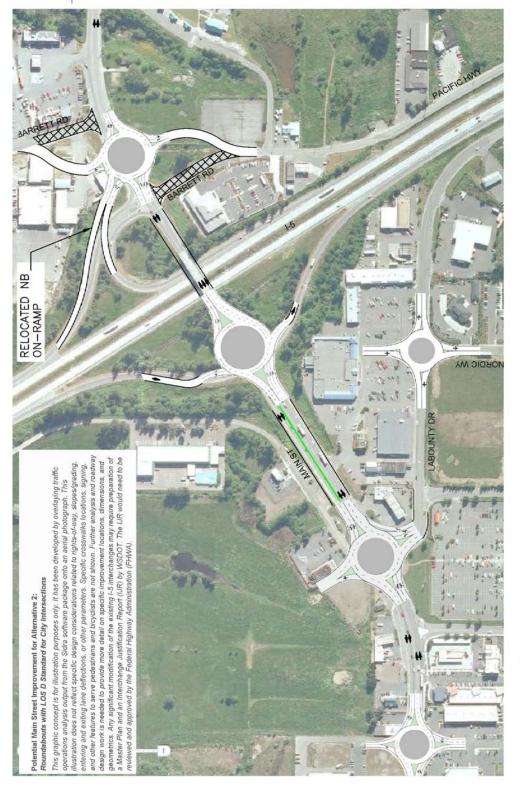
Potential Main Street Corridor Improvement Concept for Preferred Alternative – Roundabouts with LOS D Standard for City Intersections
